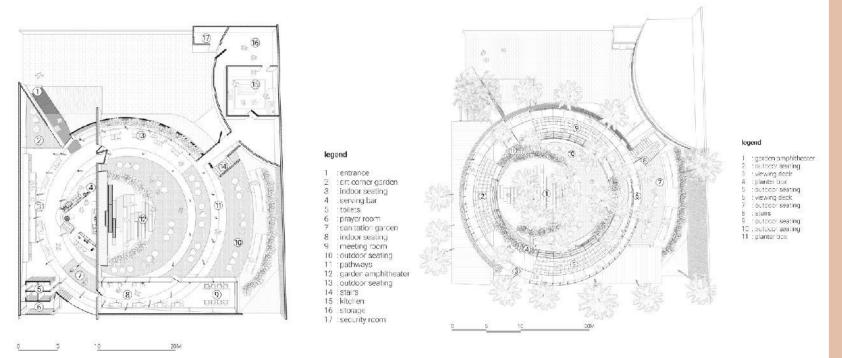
Tanatap Ring Garden Plan. Source : ArchDaily
